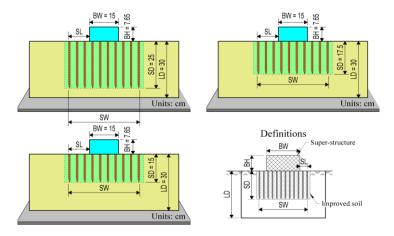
Side view of test conditions (small-scale 1-g model tests) and basic geometrical definitions
